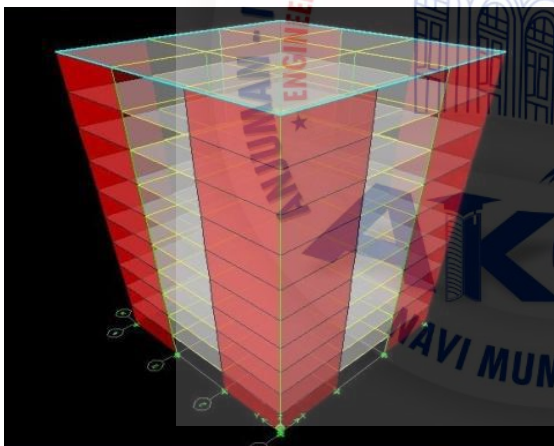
G + 9 Storey Building with and without Shear wall [6]
